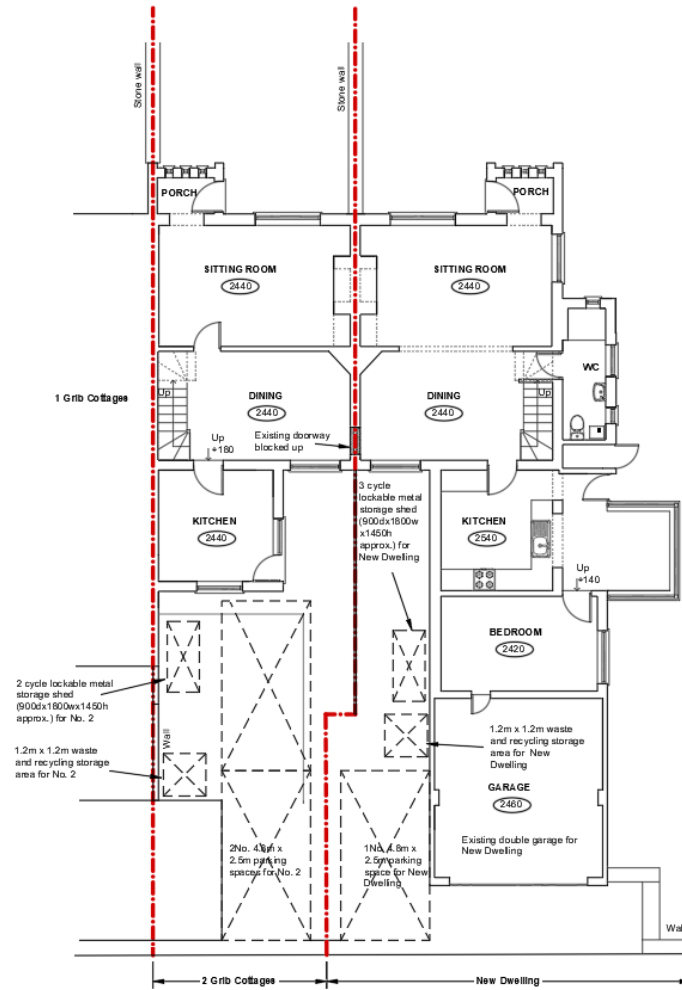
Proposed ground floor plan of 2 Grib Cottages and New Dwelling
